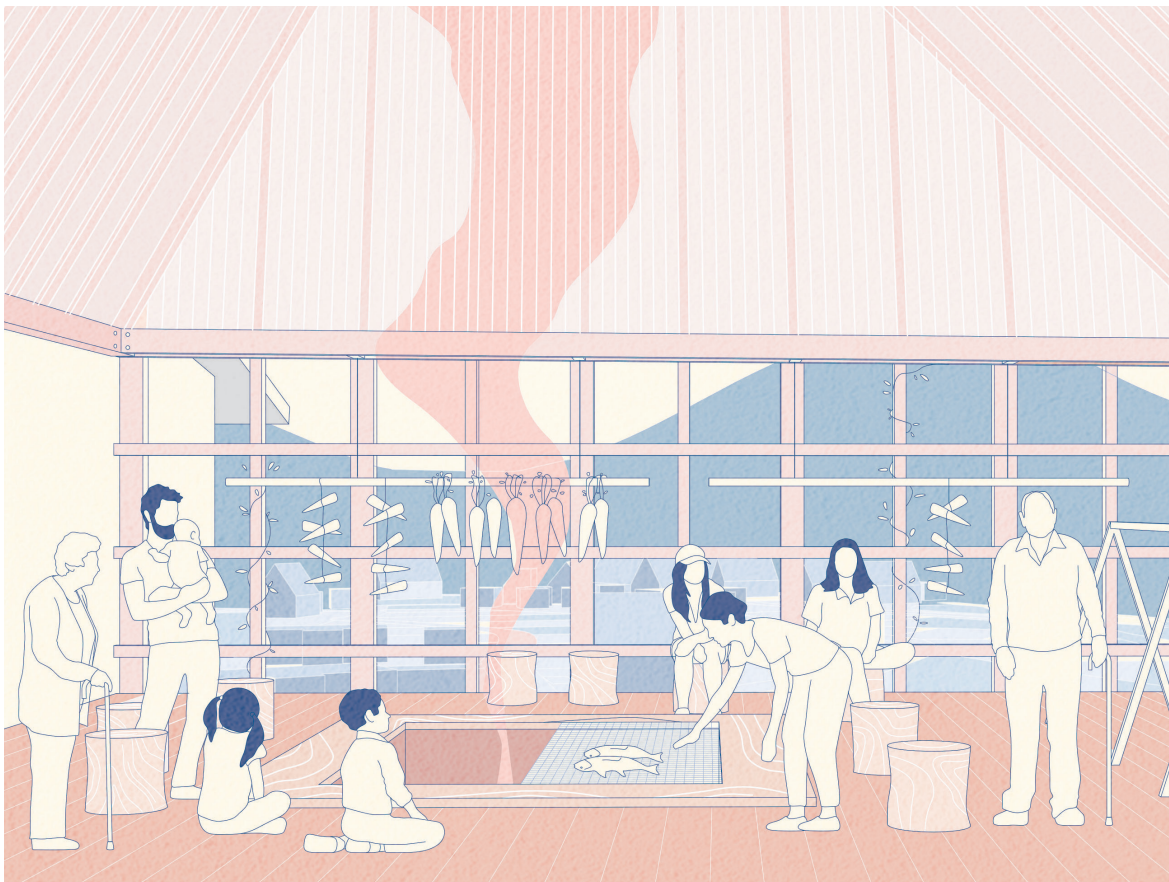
Perspective showing additions proposed to the existing facade
